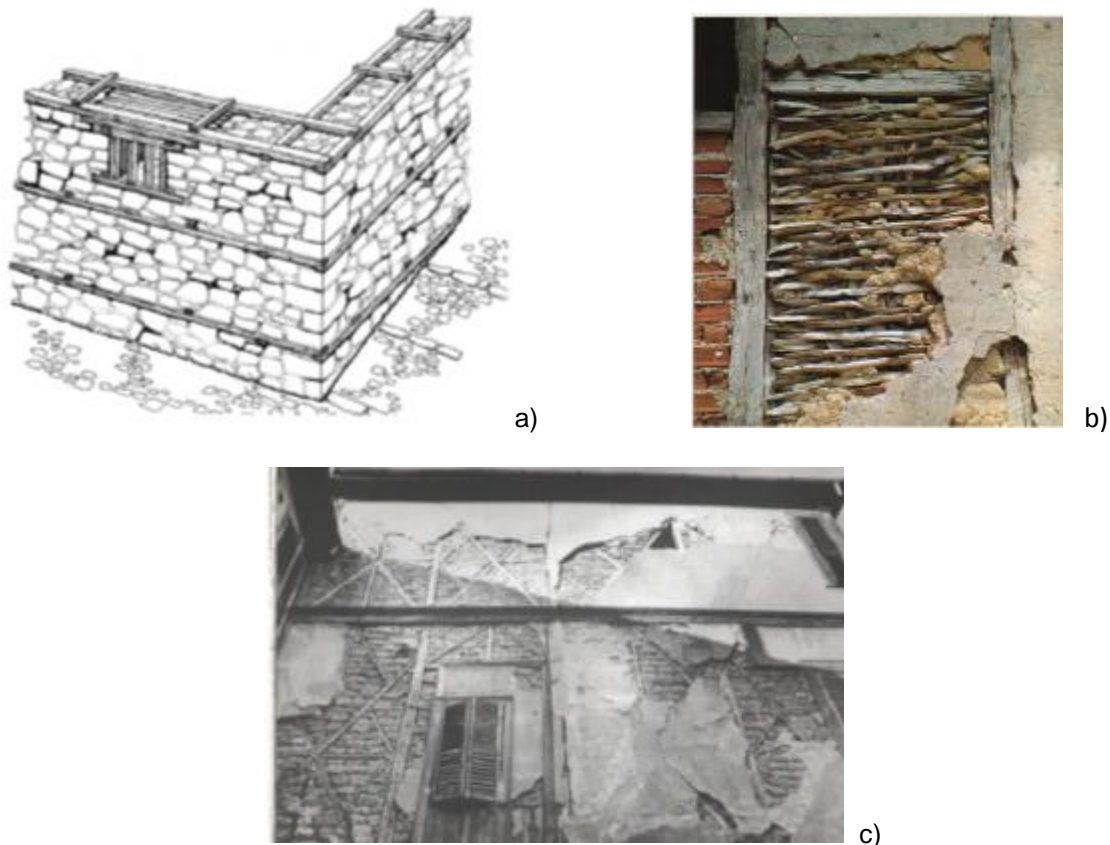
a) Horizontally, embedded, wooden elements within the wall, b) Wall made of vertical, wooden, supporting elements that were filled with wattled reeds or nailed laths and covered with plaster (*ksiloplekti tichopiia*), c) Half-timbered wall (*ksilopikti tichopiia*) [6].
